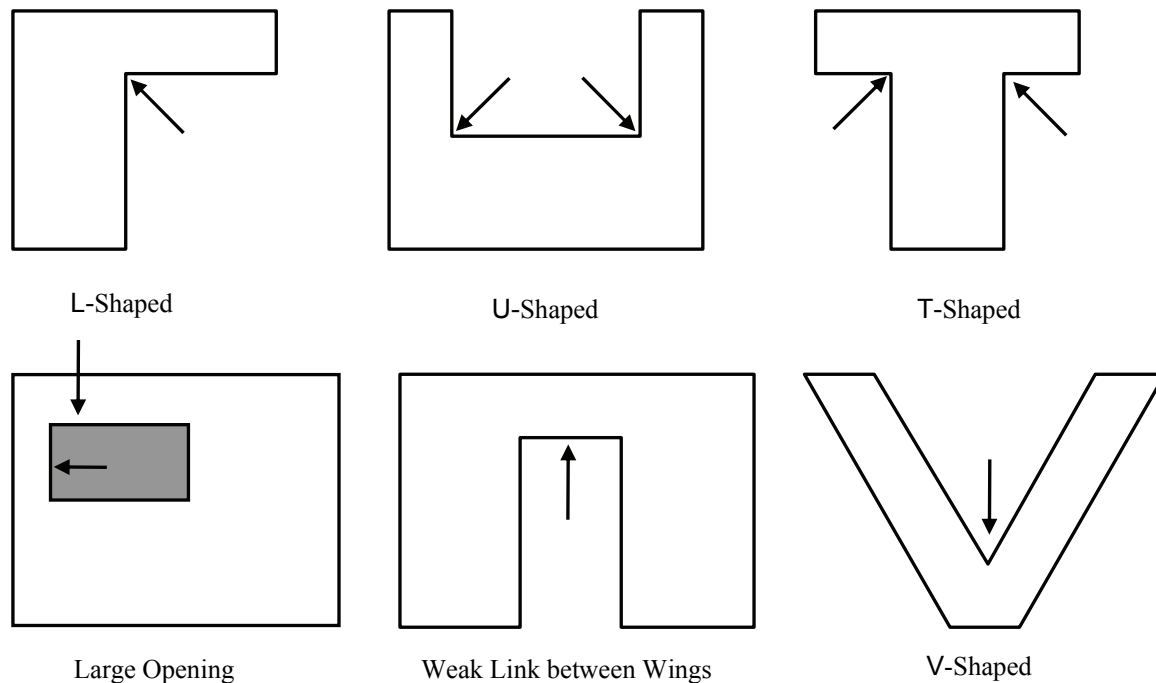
Plan Irregularities in Buildings with Reentrant Corners; Arrows Indicate Possible Areas of Damage (Source: FEMA154, 2002)
